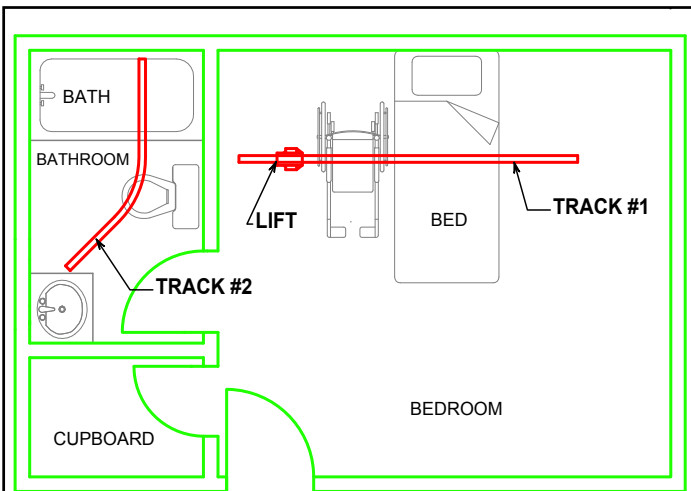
A - Sample floor plan showing basic components of a portable ceiling lift system.
